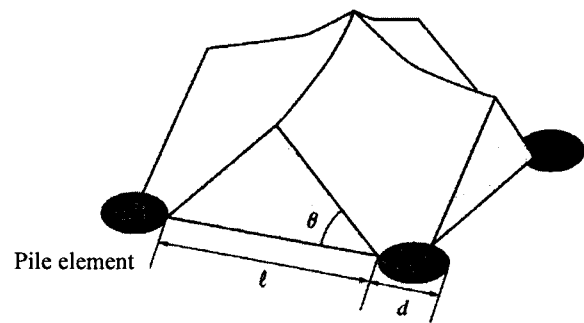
The proposed model of the embankment load that act on the ground between the piles at existing design method (PWRC(2000)).
